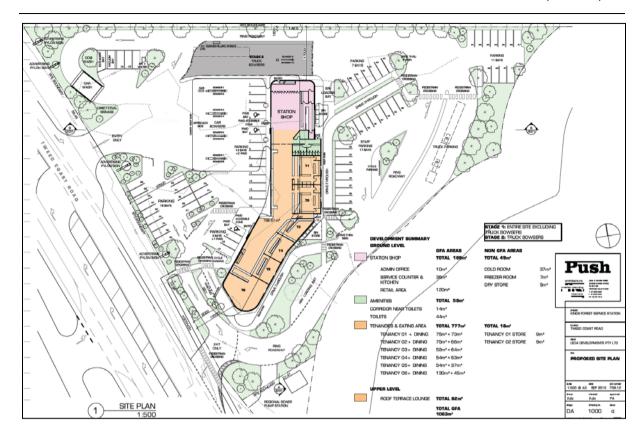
PROPOSED SERVICE STATION PLAN
